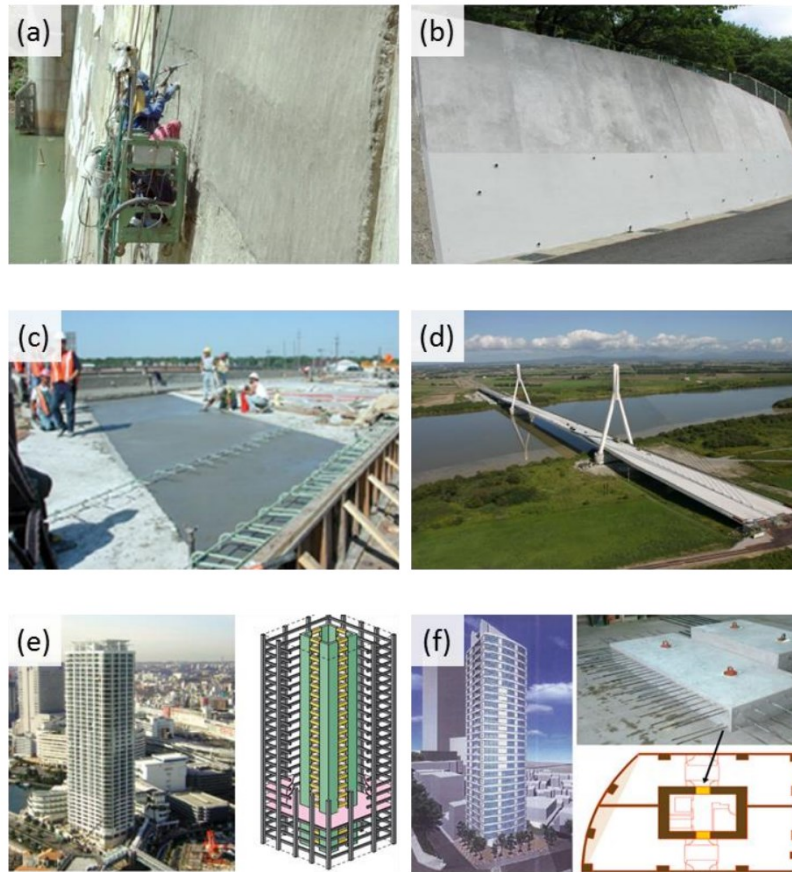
Different SHCC/ECC applications (after Ohno et al. [65]): (a) structural repair of concrete dam [66], (b) surface repair of retaining wall [67], (c) bridge-deck link slab [68], (d) bridge-deck overlay [69], (e) and (f) structural dampers for high-rise buildings [70].
